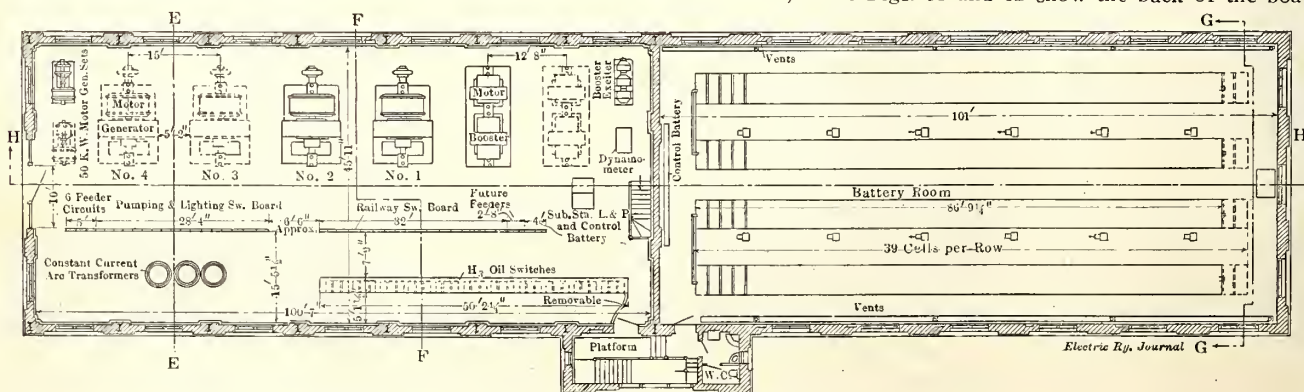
Detroit Tunnel—Plan of First Floor of Substation
